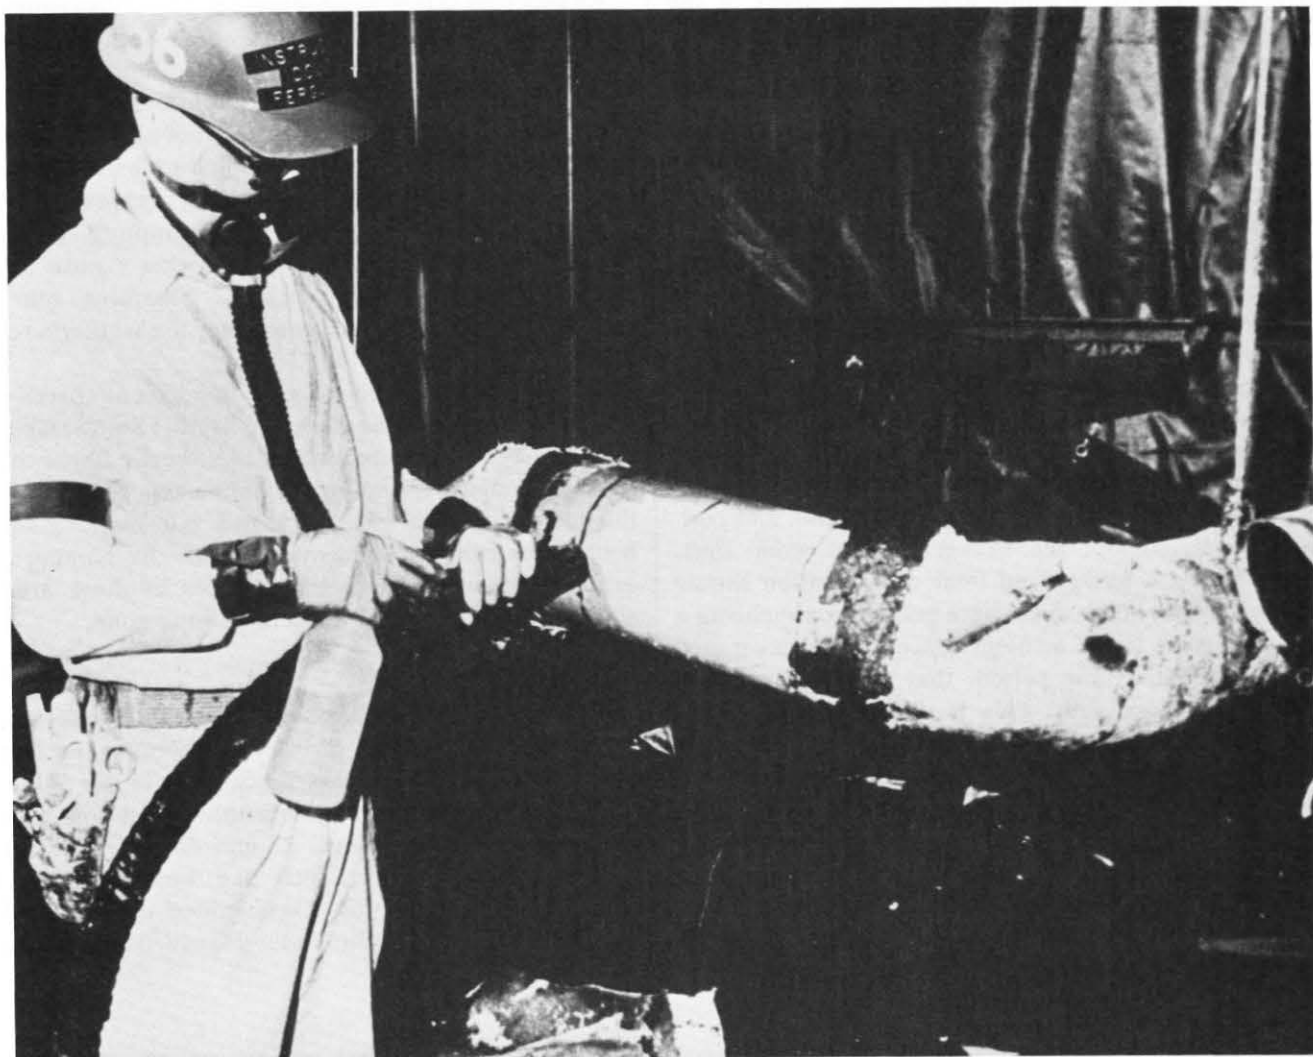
Asbestos-containing insulation being removed from a section of pipe. This is one example of a job where air samples should be collected before, during, and after the job.
